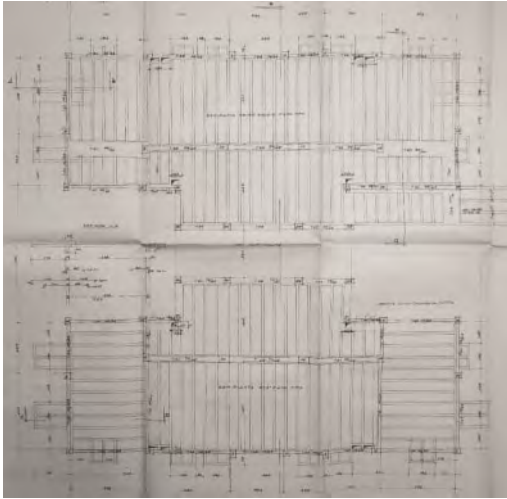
Bottom floors structural plan (detail 1:50) adopted in blocks B1 and B4 by Saicca (AST, 1).
